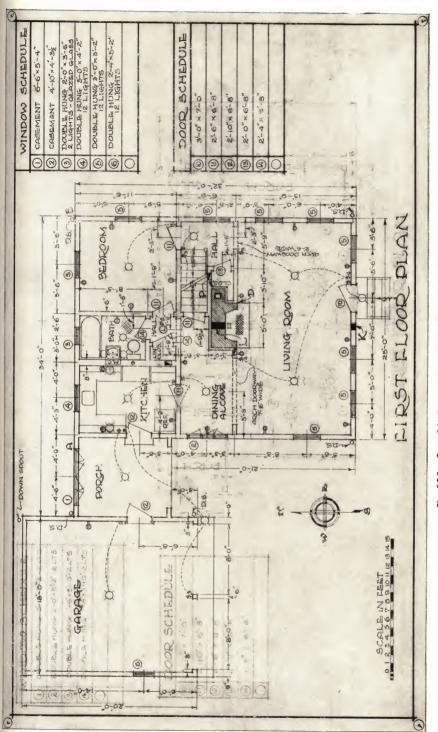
Step 5 In Drawing Remodeling Plans for First Floor
